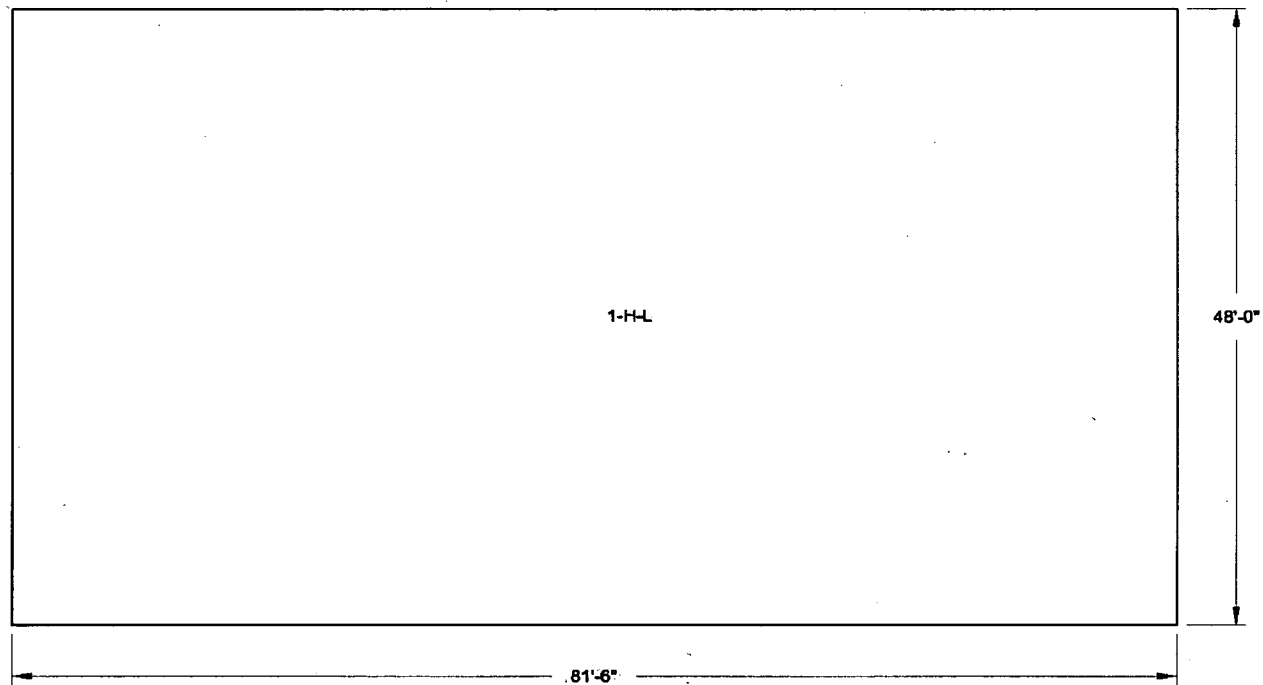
H.6-144: SLAB 1 LOOKING DOWN
